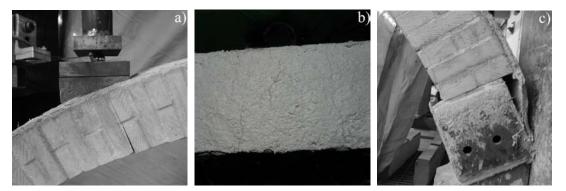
Failure details of PBO-FRCM extrados strengthened arches: a) hinge formation on the loaded cross section; b) superficial cracking of the cementitious matrix; c) shear sliding at the right abutment.
